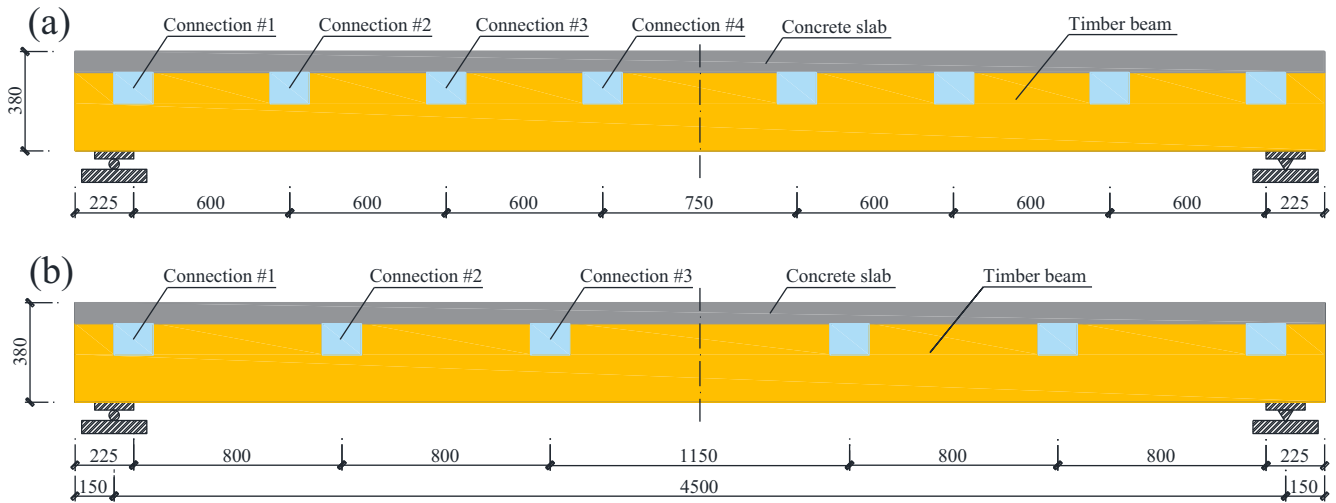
Geometric details of beam specimens: (a) TCC-1 and TCC-3, (b) TCC-2 (Unit: mm).
